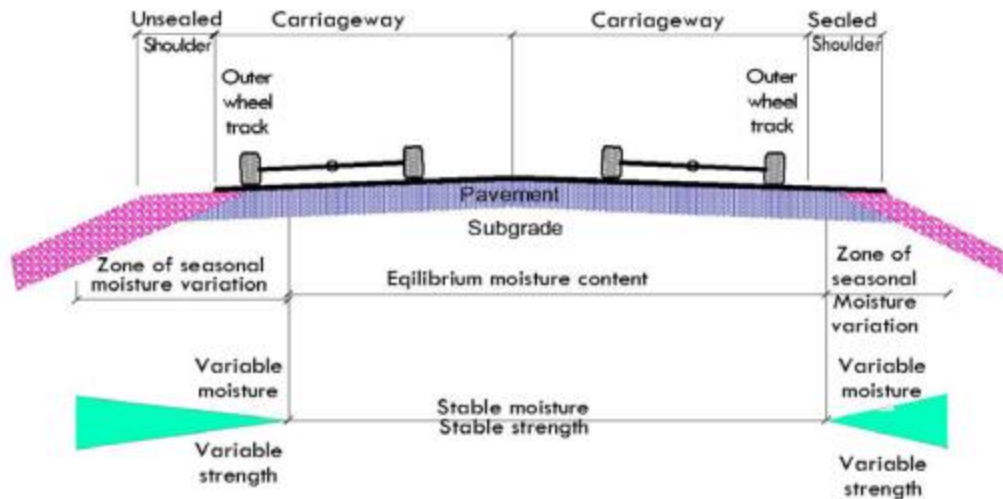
Moisture Zones in Road Pavement (ERA, 2013)
